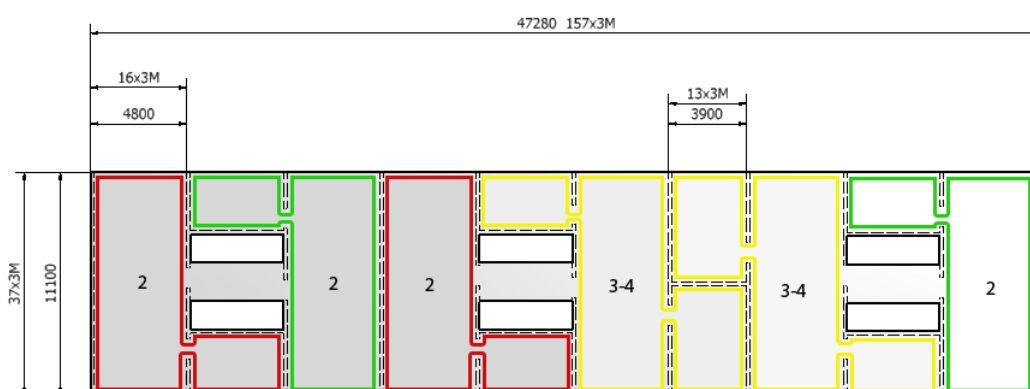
Plan arrangement for the fictive structure, the openings are made for the staircases. The numbers represent the number of rooms in each apartment.
